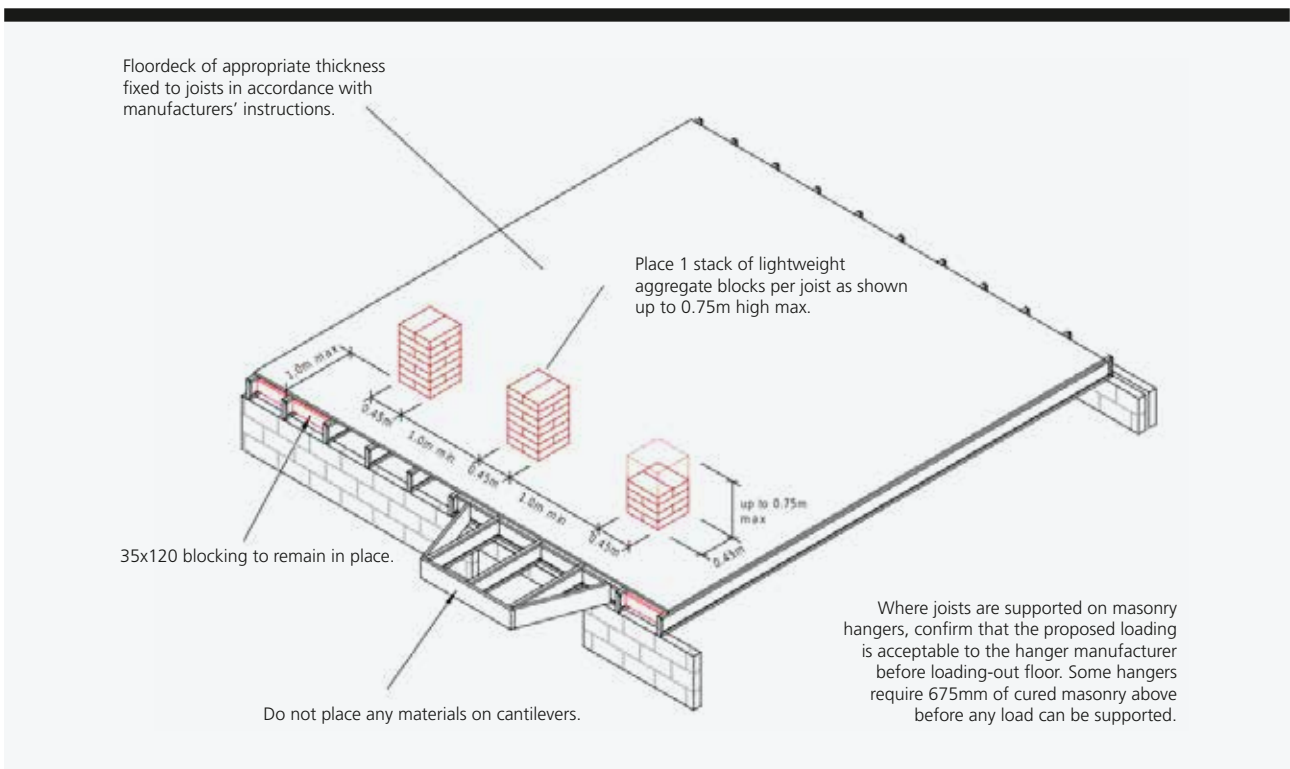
Loading-out of LAC blocks up to 1500kg/m<sup>3</sup> onto a decked floor.
